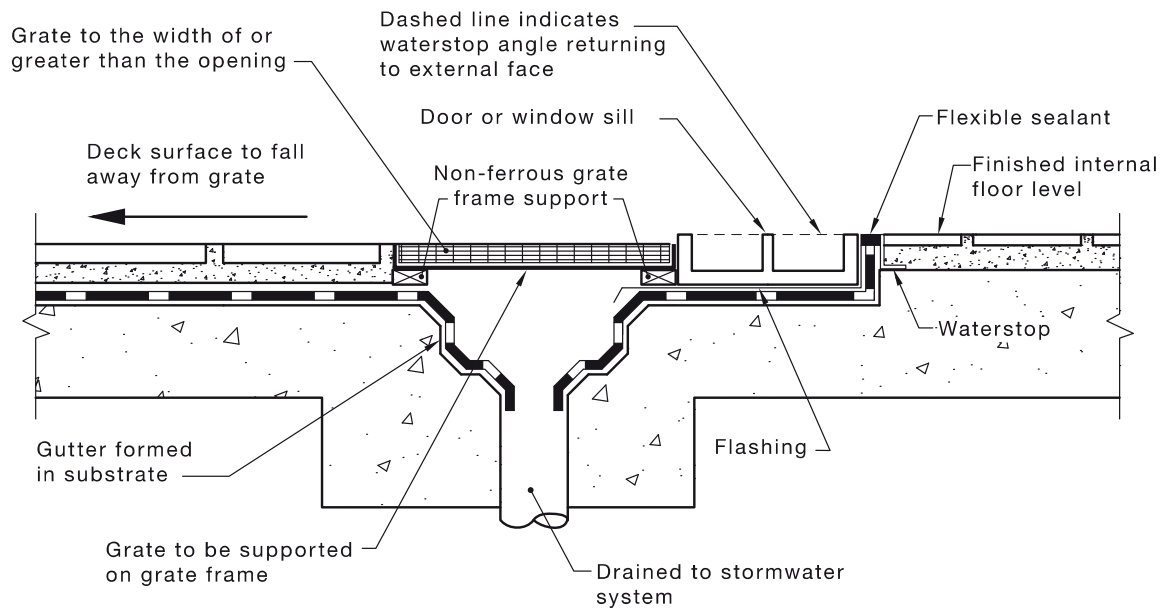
TYPICAL DETAILS OF MEMBRANE TERMINATION AT WALL OPENINGS WHERE THE INTERNAL AND EXTERNAL FINISHED FLOOR LEVELS DO NOT ALLOW FOR AN UPTURN
